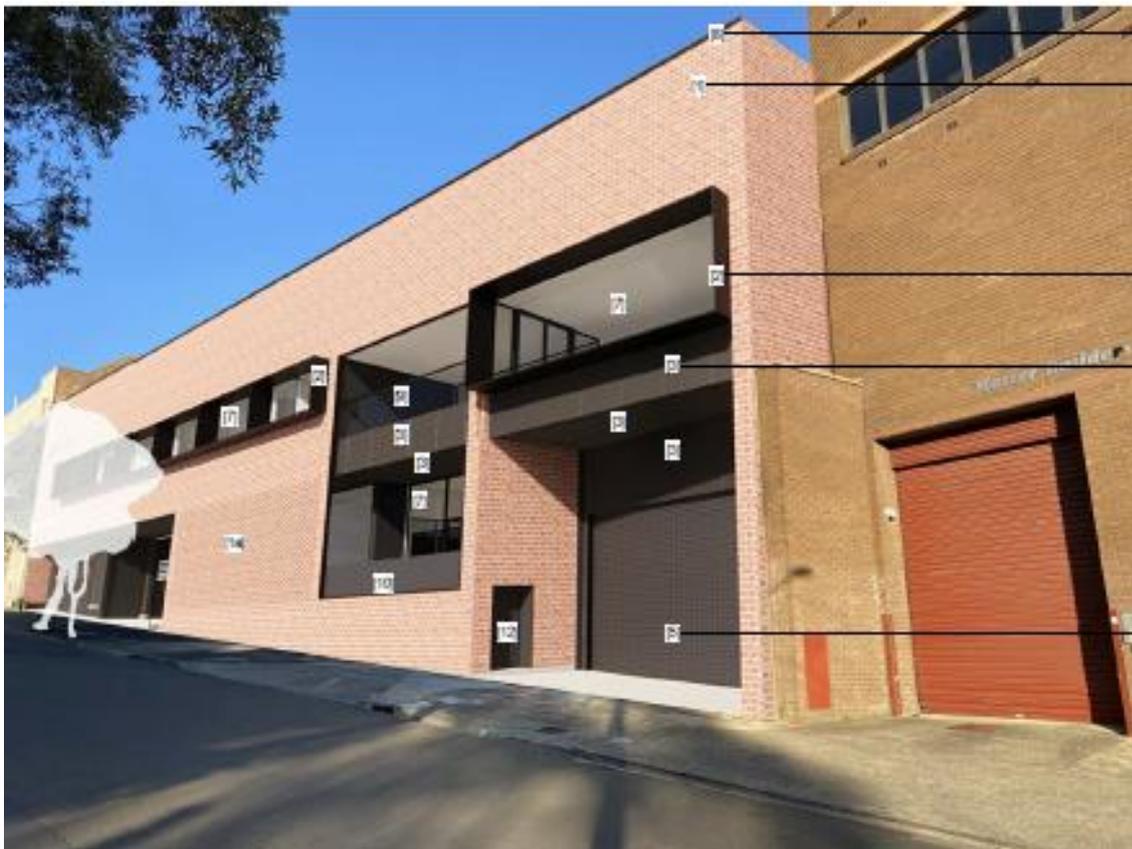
Proposed photomontage of Ambulance Station from Arundel Street looking northwest
